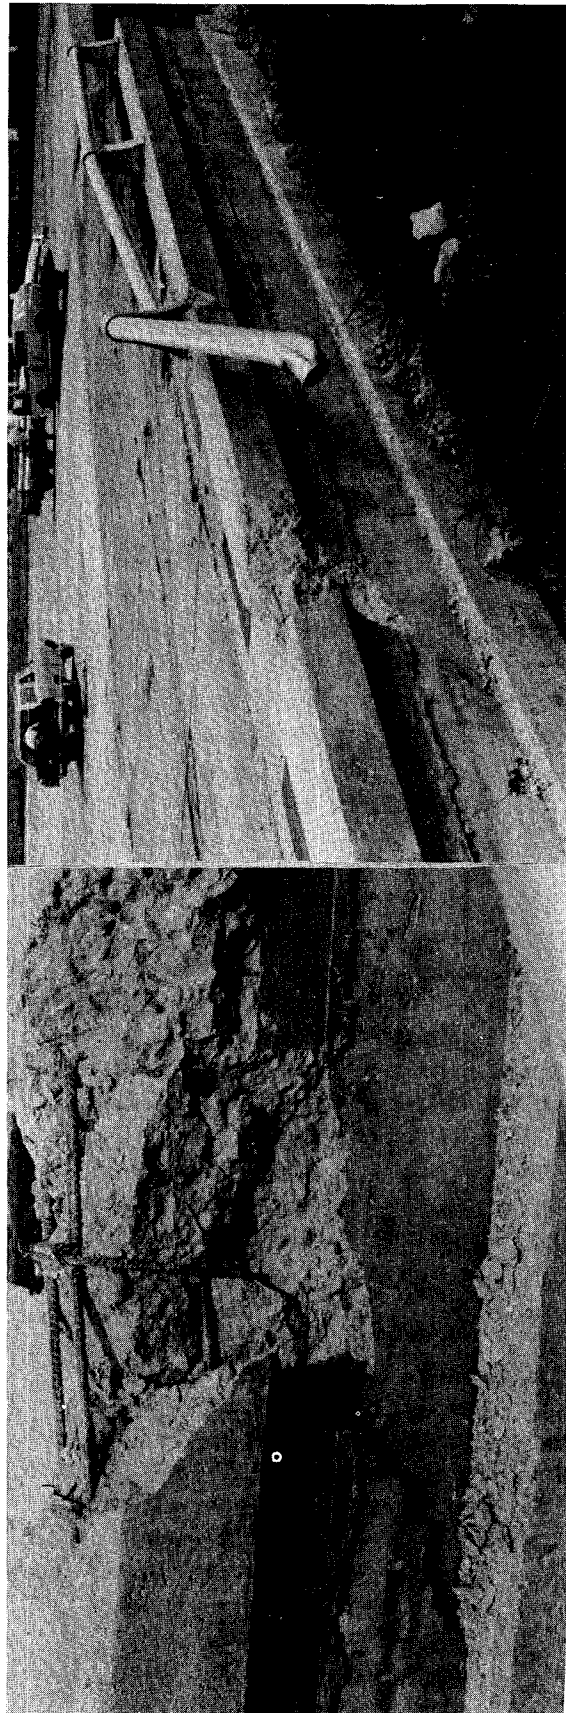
VIEWS OF BRIDGE RAIL DAMAGE DUE TO TEST RF -9
